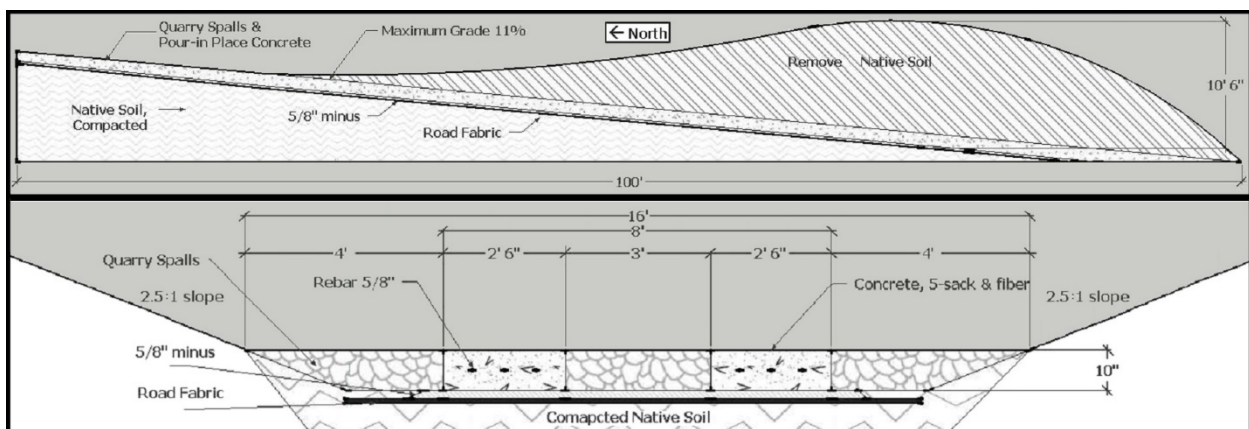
Side and longitudinal cross section drawings of the proposed boat ramp.
